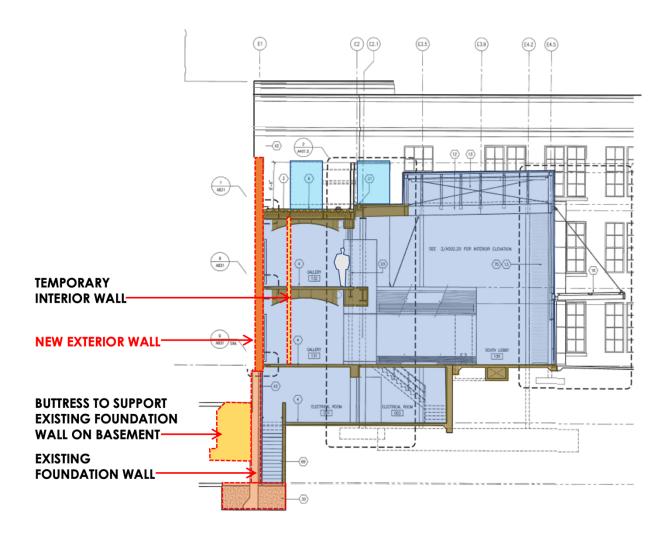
East Classroom Building Replacement Wall and Foundation Buttress Support
